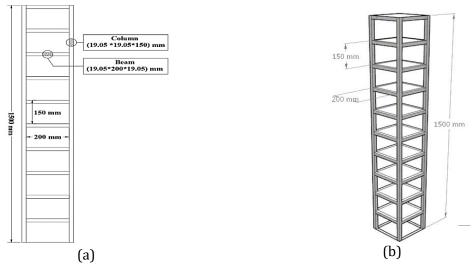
Ten-story steel structure details (a- front view b- 3d view)
